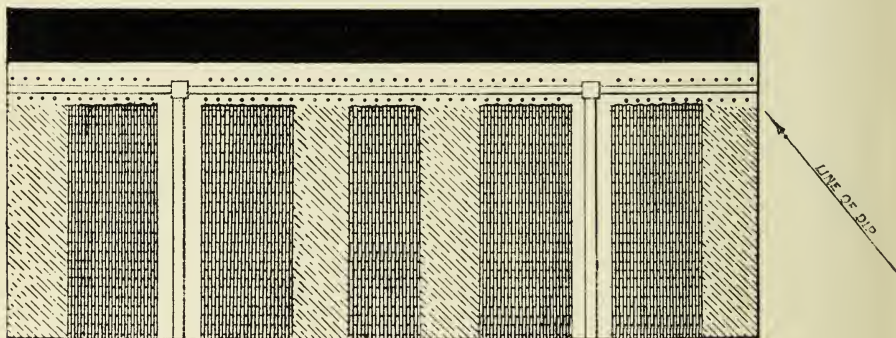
CANNOCK WOOD COLLIERIES, SOUTH STAFFORDSHIRE. PLAN SHOWING LONGWALL FACE IN THE DEEP COAL SEAM, AND THE STALLS, PACKS, AND PROPS CONNECTED WITH IT.
